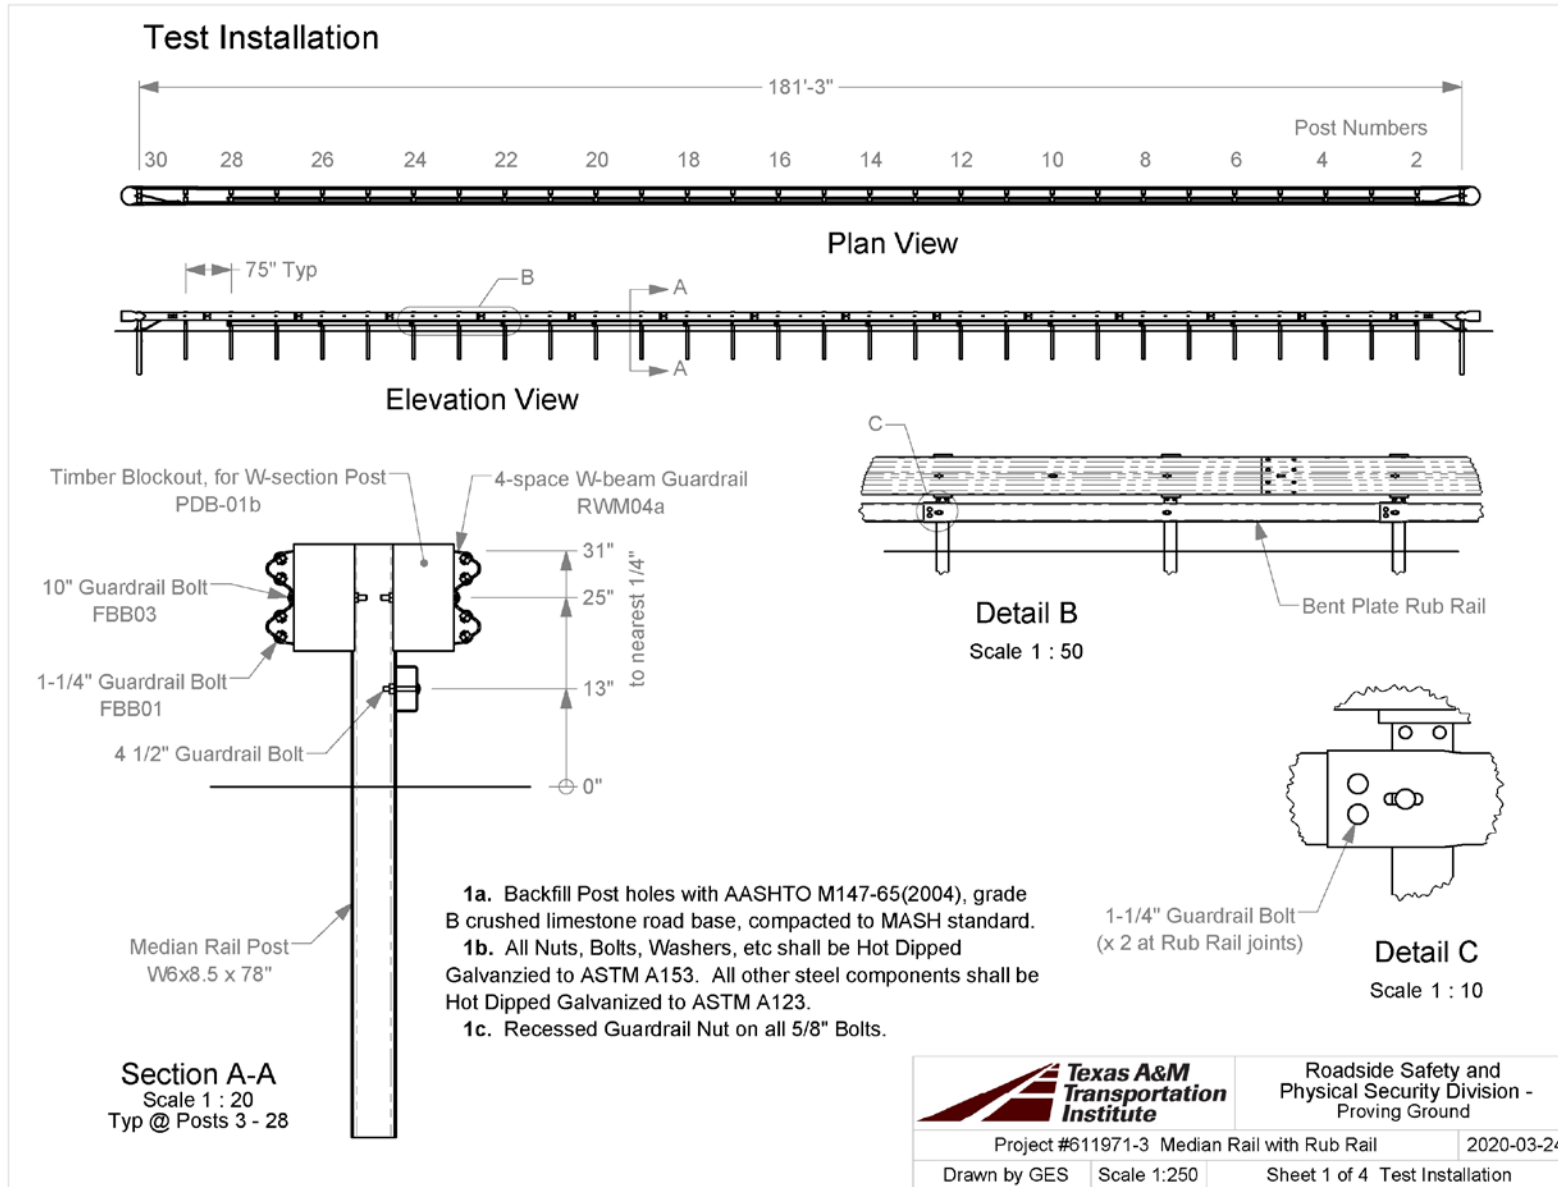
Details of W-Beam Median Barrier with Rub Rail.
